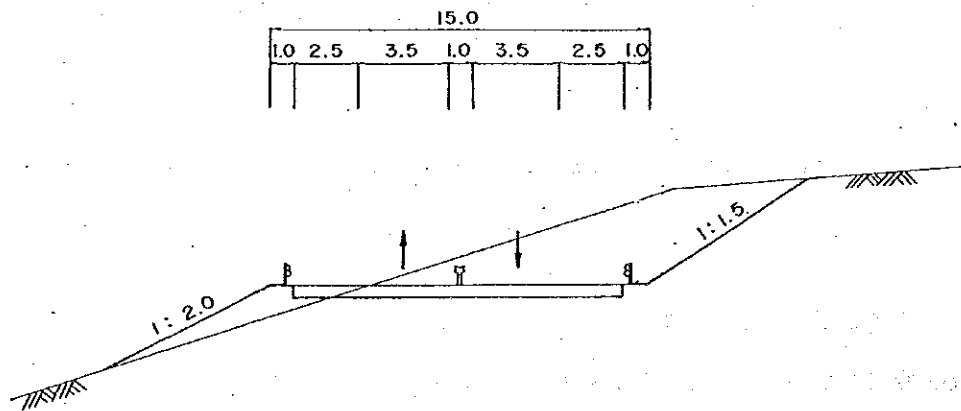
Typical Cross Section on Provisional two Lane Stage Construction.
